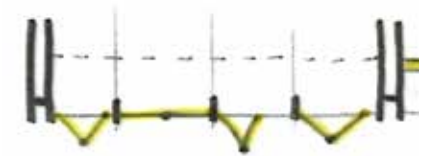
Initial design exploration 2 - West facade Plan
